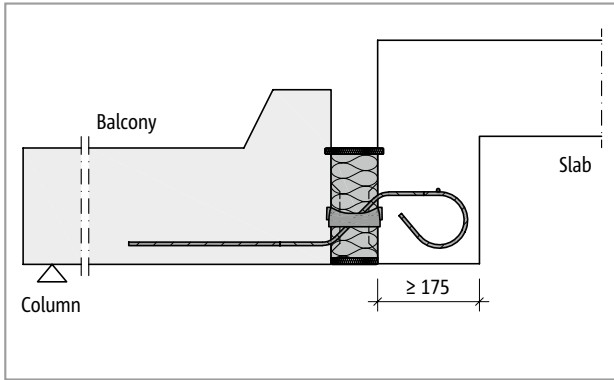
Schöck Isokorb® T type Q: Installation situation "pre-cast balcony slab" (e.g. T type Q-V1 to Q-V5)
